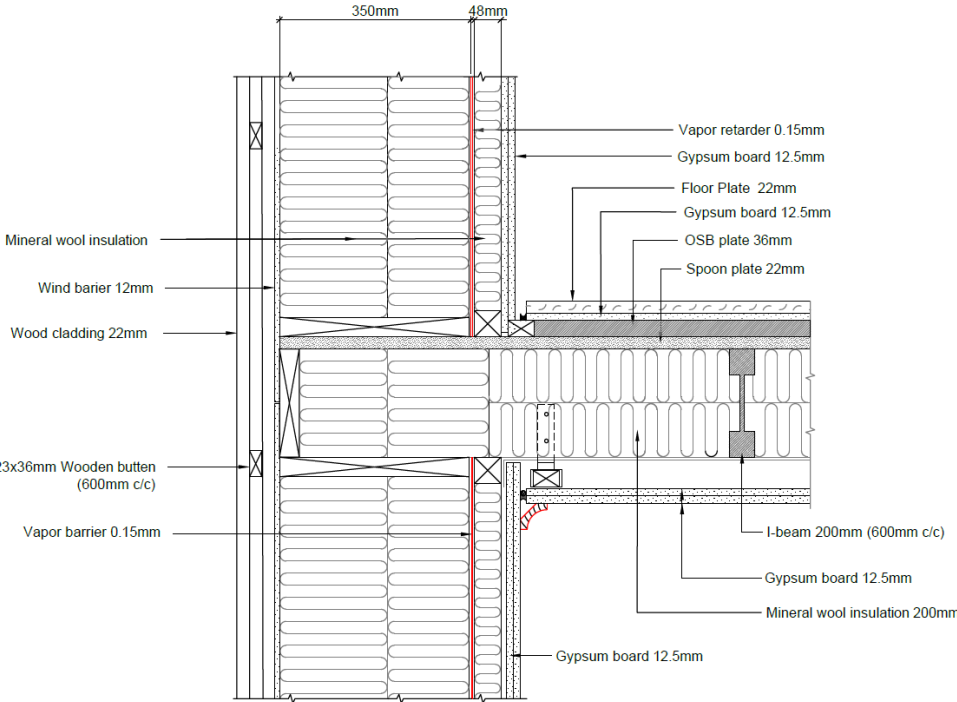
timber wall and floor detail (Byggforsk TEK17)
